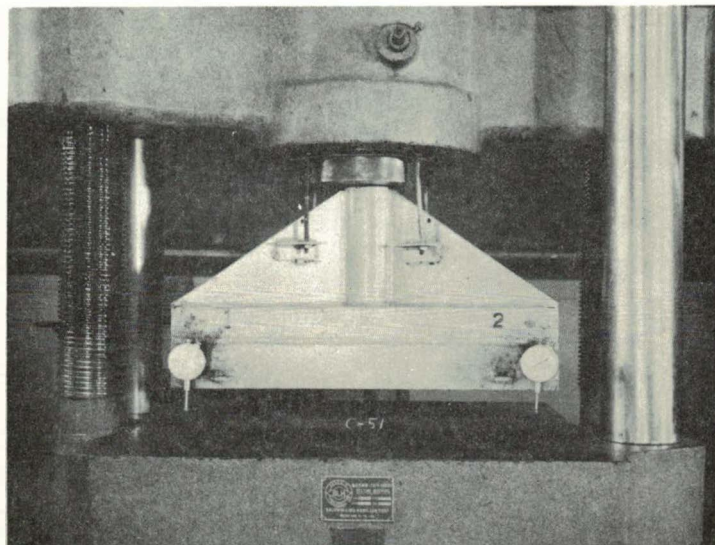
Concrete bearing block connected testing machine. Test pad and dial gages in typical position
